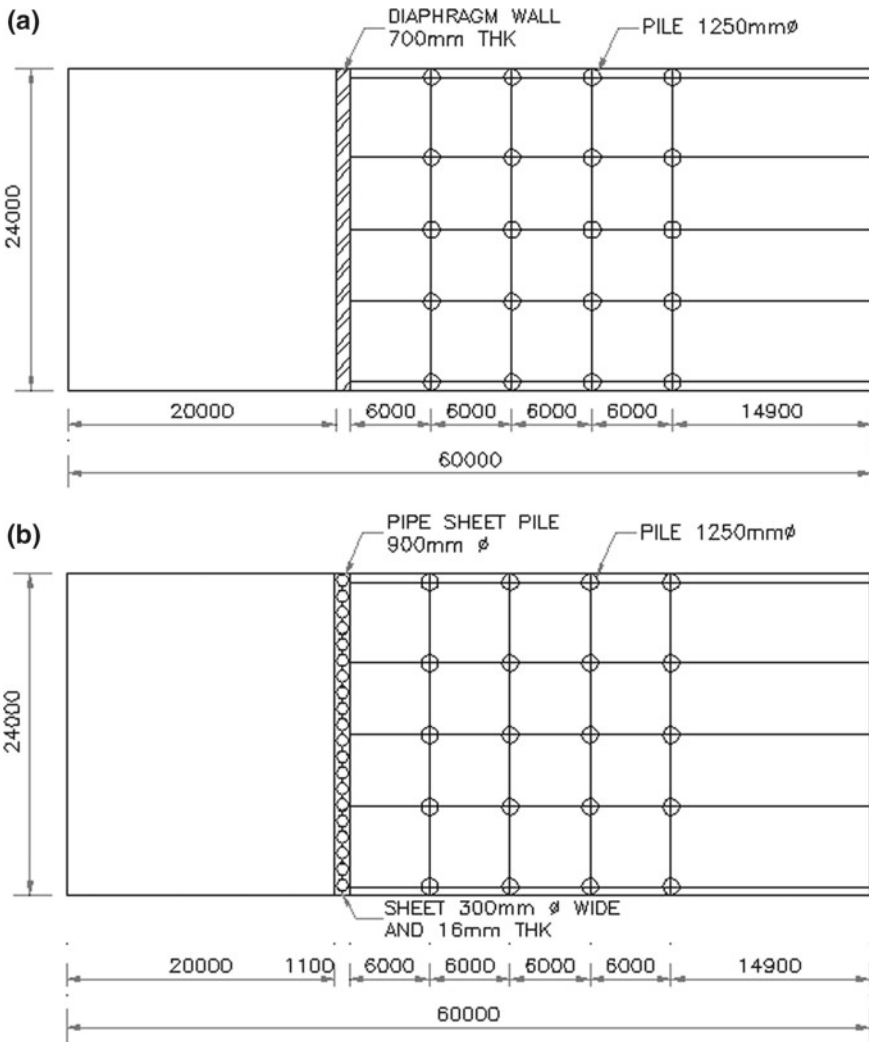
a Plan of diaphragm wall berthing structure. b Plan of pipe sheet pile wall berthing structure
